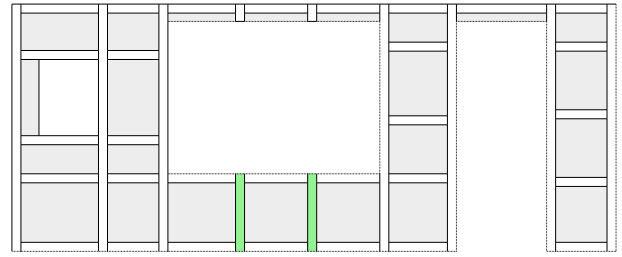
Plywood-aluminium structure layout on the second case study facade
